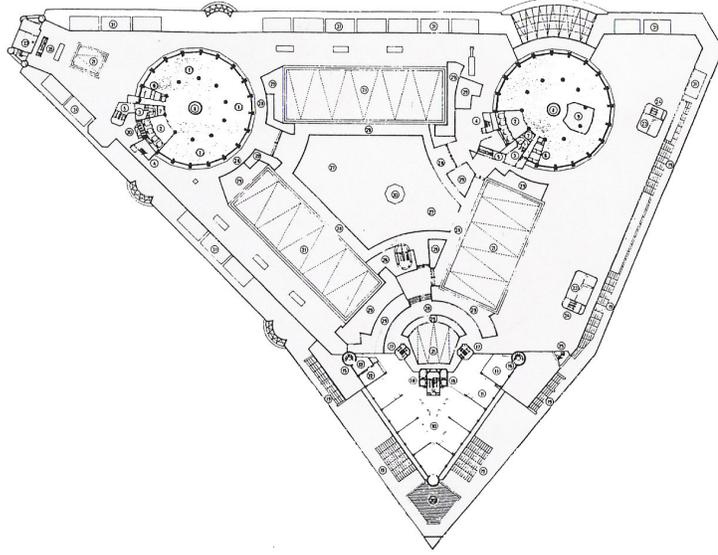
Garden floor plan of Akmerkez (Uran, F. (1995). "Akmerkez." *Yapı*, 158. p. 75.)
